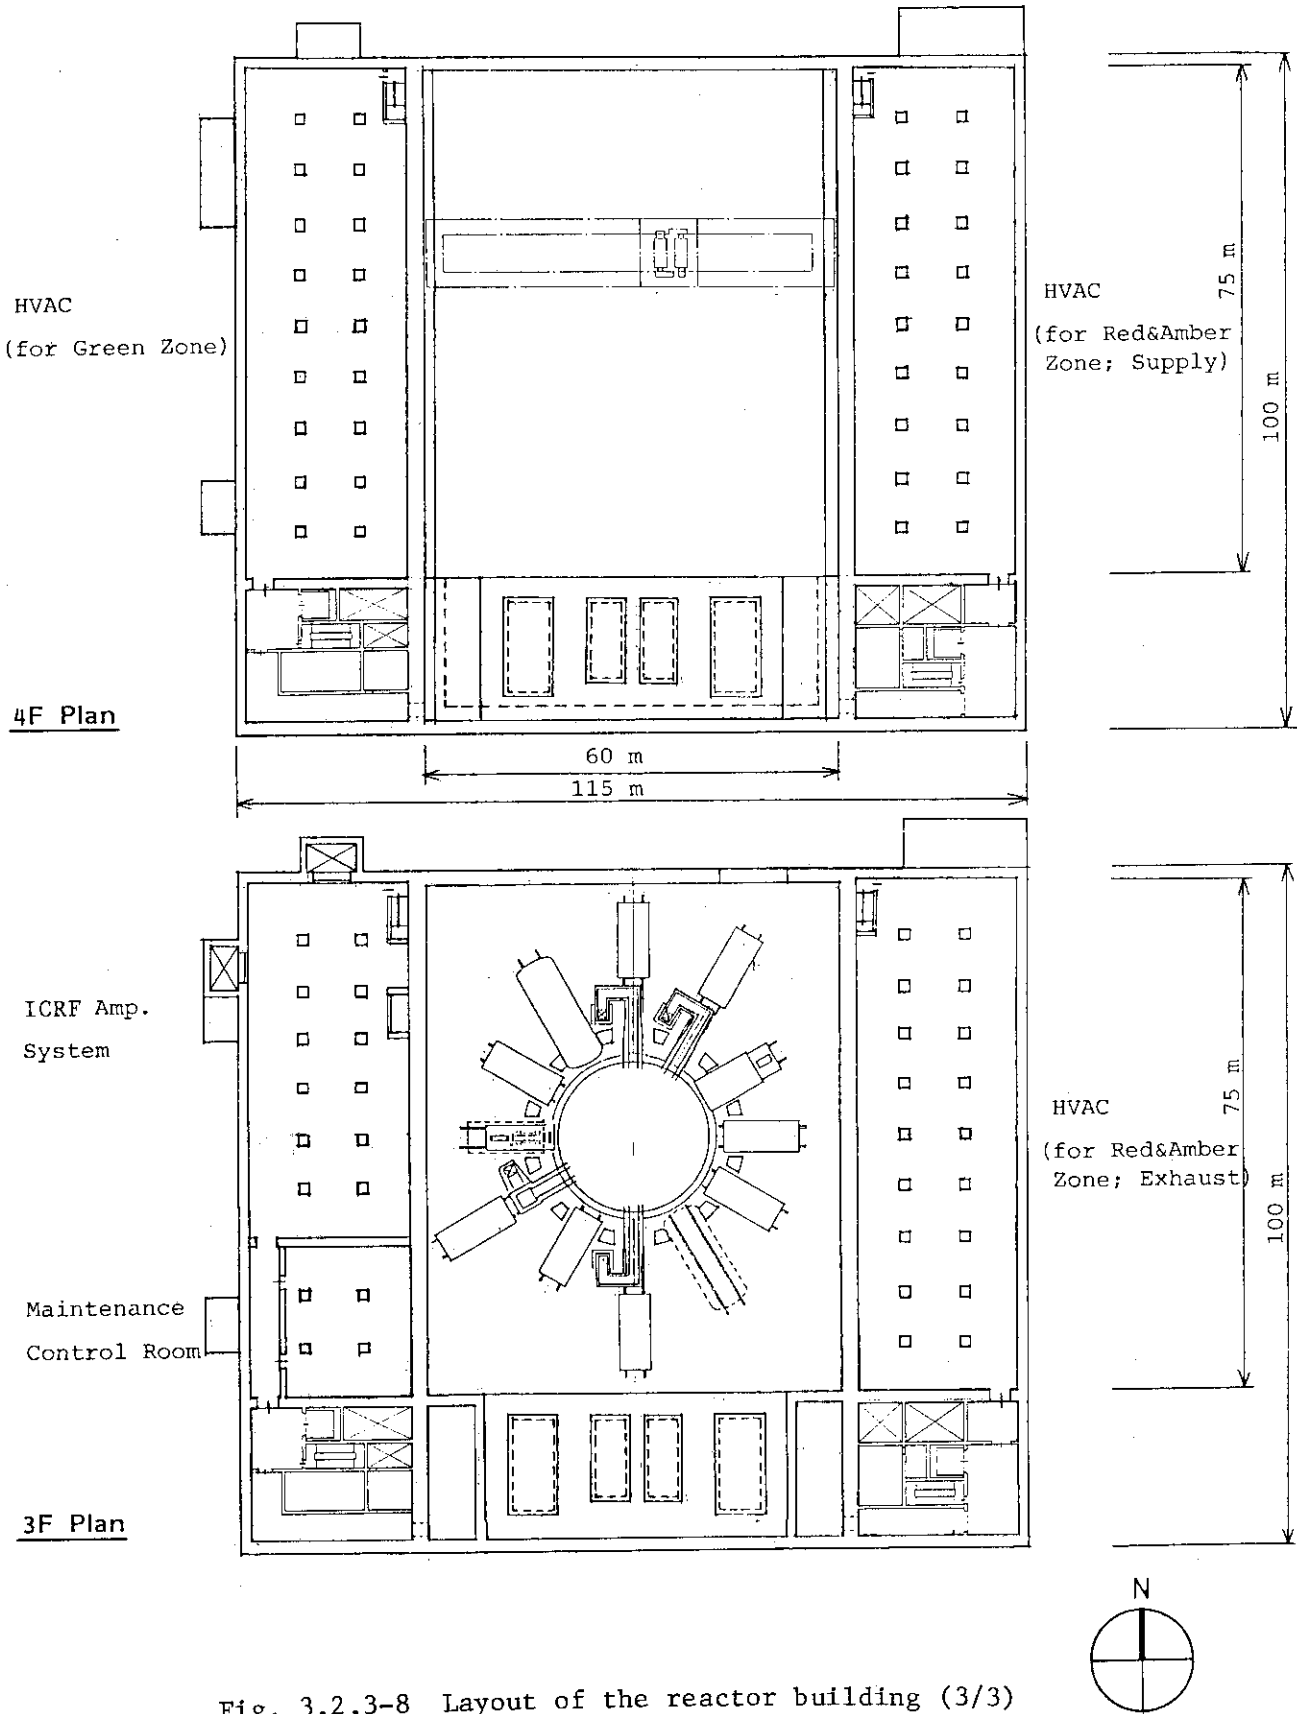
Layout of the reactor building (3/3)
